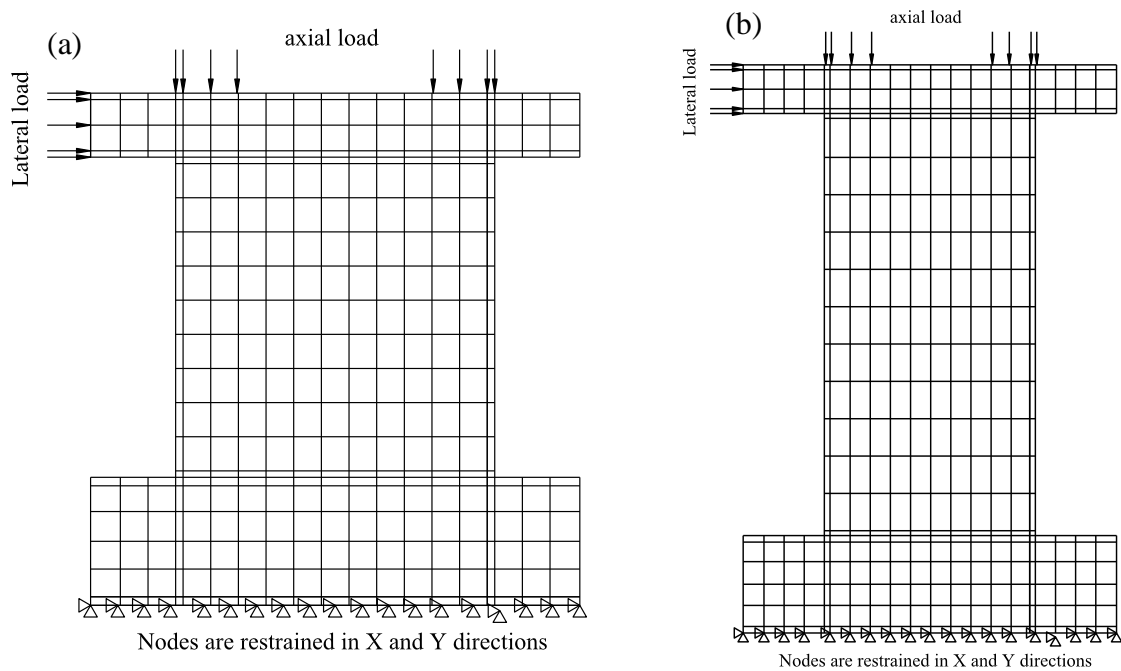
Numerical models of (a) type I and (b) type II walls tested by Lefas (1988)
